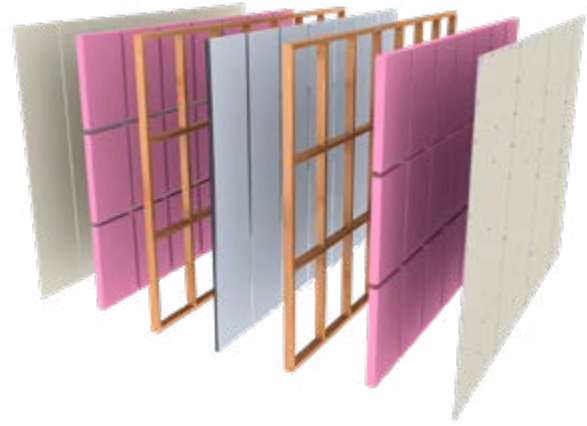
Central barrier IT wall system, conventional unit linings, some penetrations permitted
